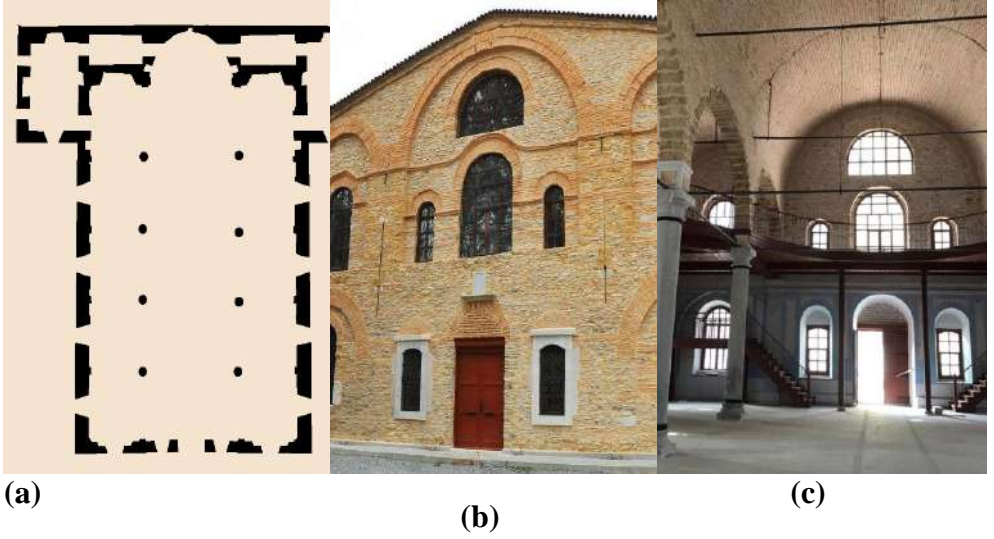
Buildings reflecting the urban characteristics of Akşehir (a- Historical Armenian Church Plan b- Church Facade c- Church Interior (illustration: authors).
